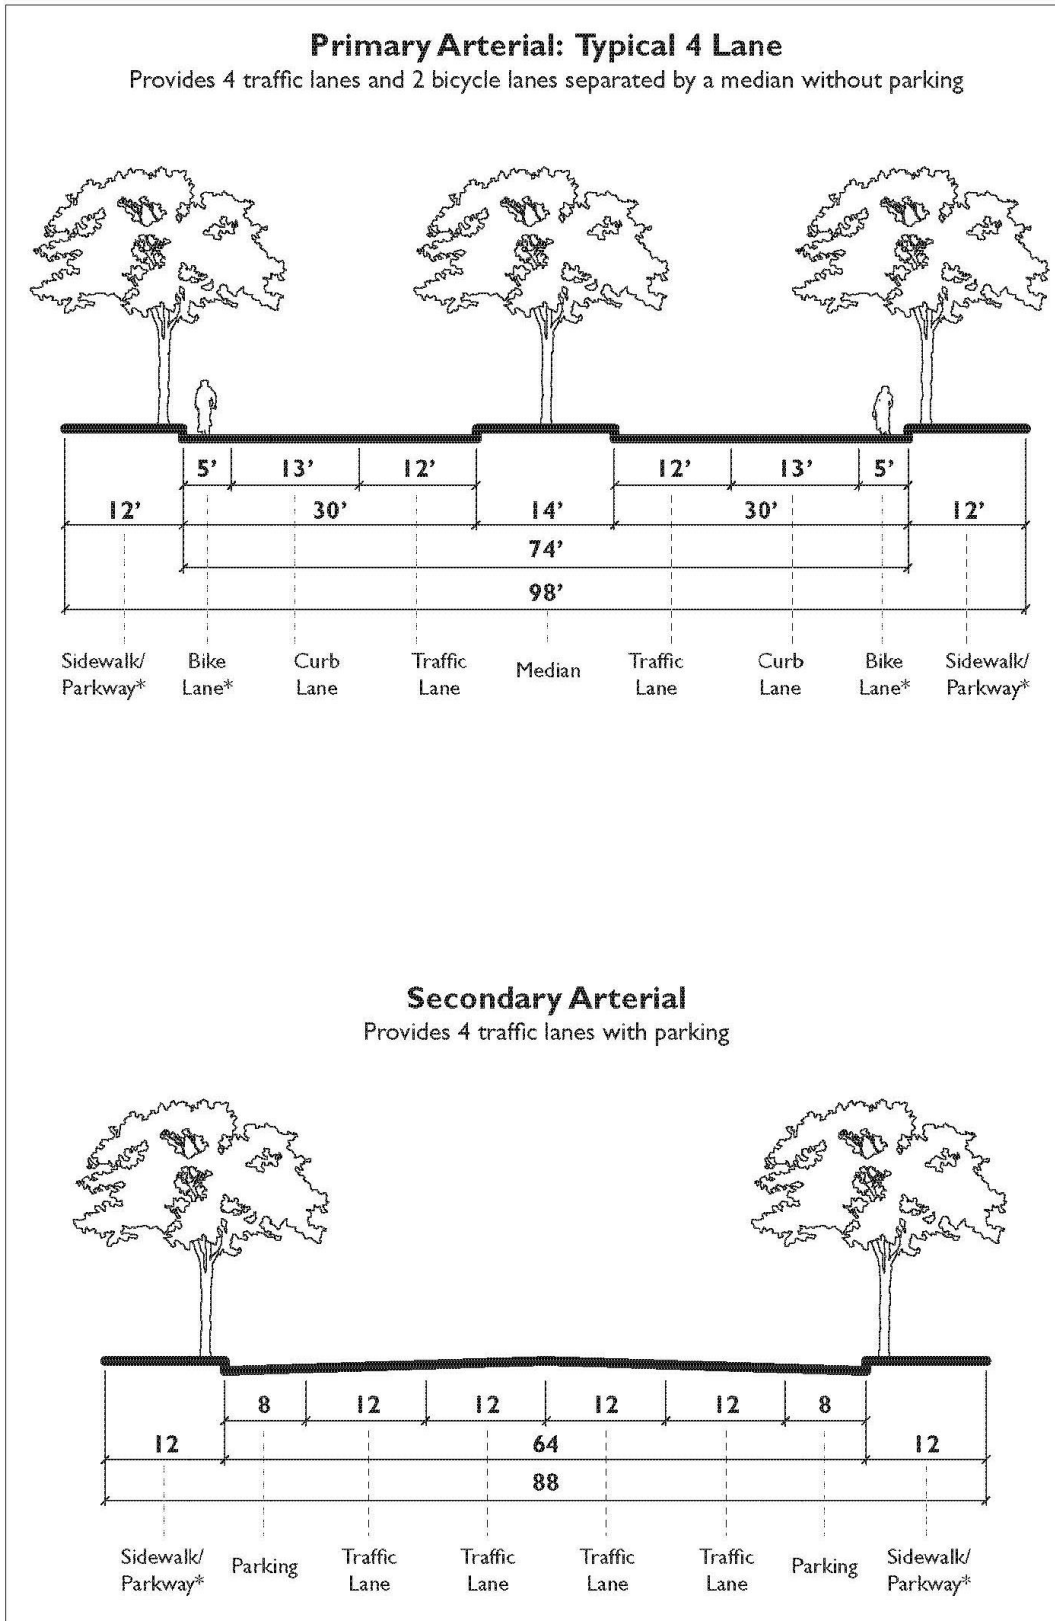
CITY OF CHINO GENERAL PLAN ROADWAY CROSS-SECTIONS (3 OF 3)
